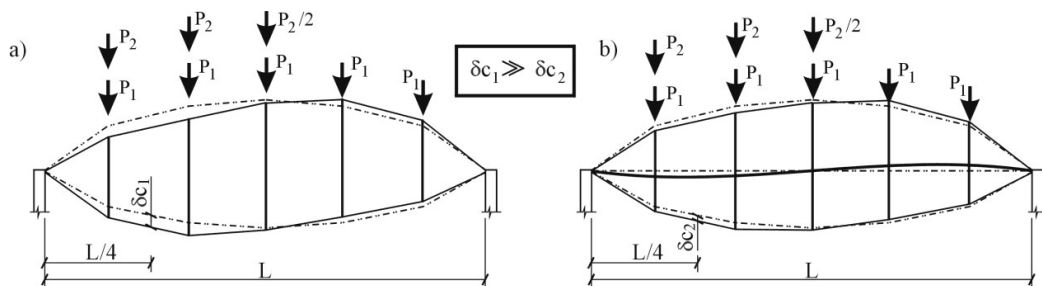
Ordinary cable truss (a) and cable truss with the stiffening girder (b).
